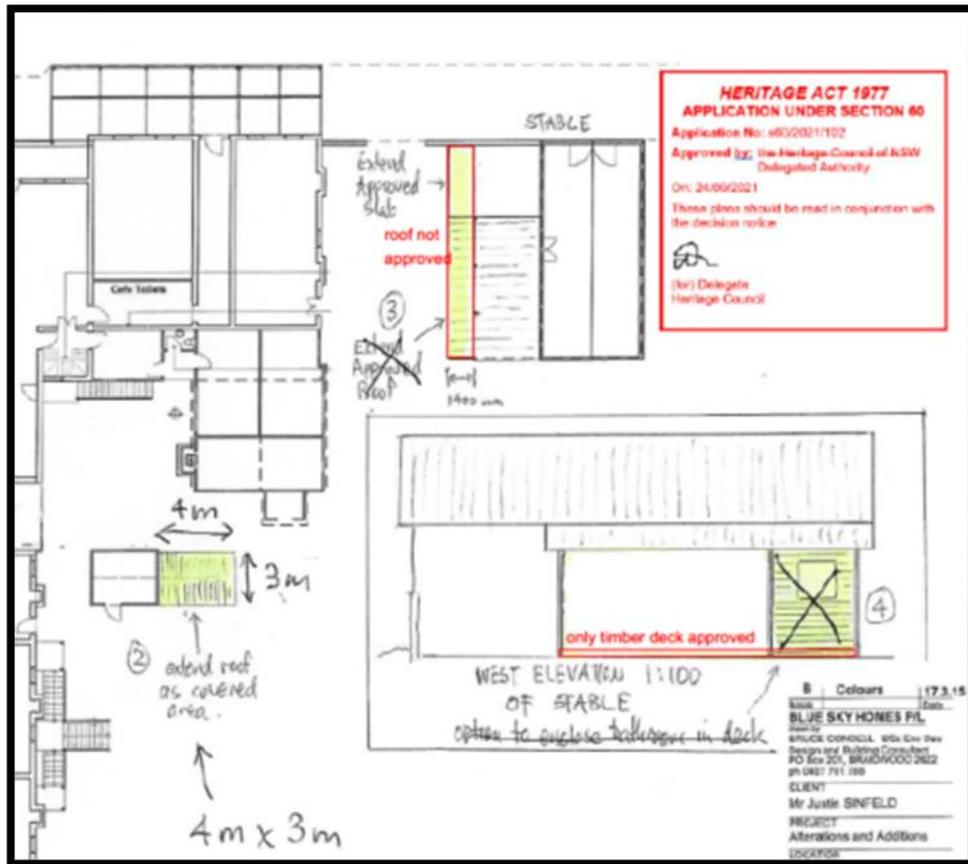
Proposed works – Extend roof to brick store, extend timber deck and slab to stables
